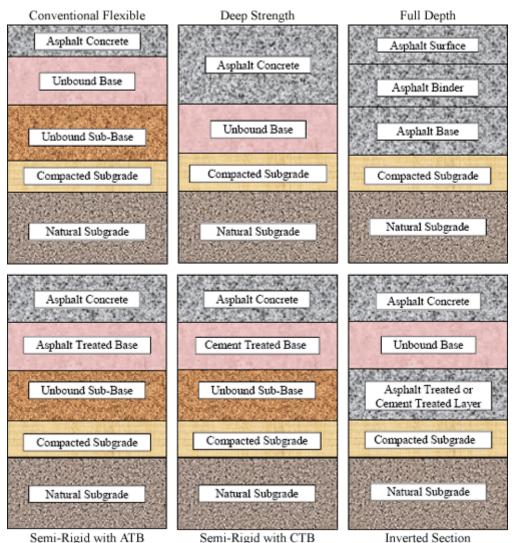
Some common variations of flexible pavement sections (NCHRP 1-37A, 2002).
